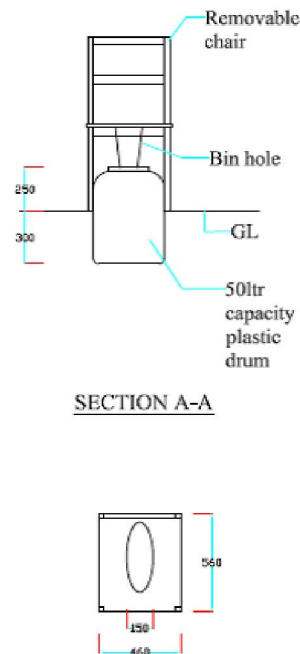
Emergency Toilet Type B and plan (source: DWSS)
